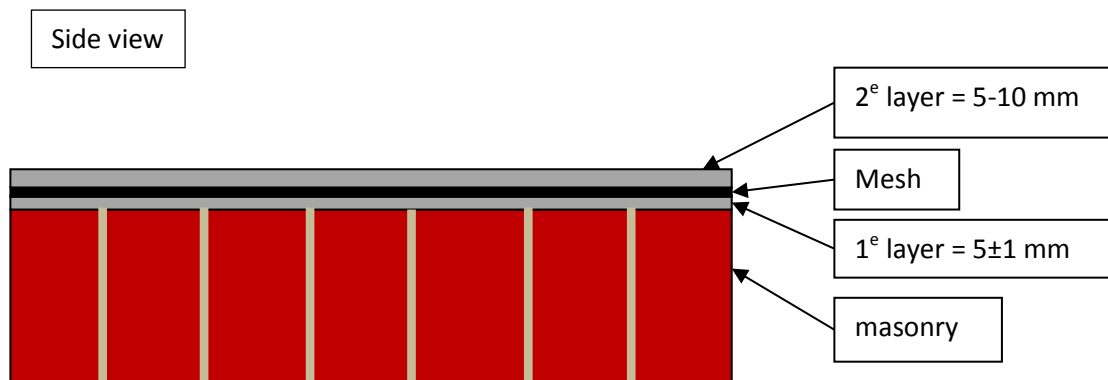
Side view of reinforced masonry wall sample (scale adjusted for illustrative purpose)
